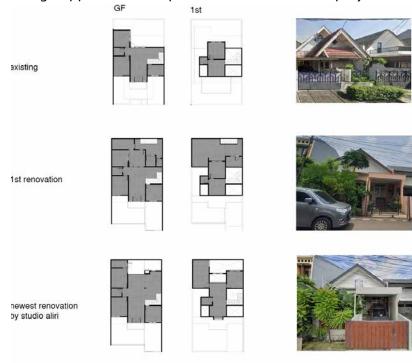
Building plan showing development and changes of the building through years. Existing in the 90's, first renovation by previous owner, and Newest Renovation in 2023.
